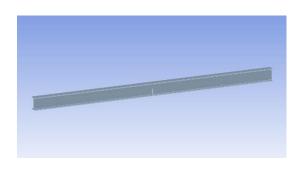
A 75mm cut slot of damaged I beam at location (1/2)L
